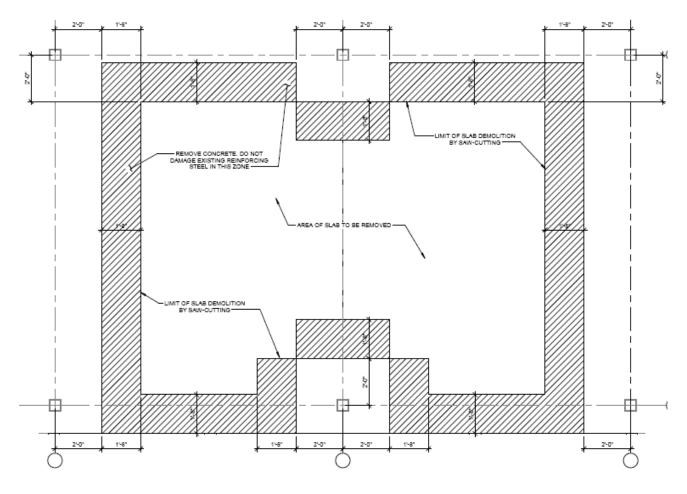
Enlarged Bathroom Slab Repair Plan for Cast-in-Place Concrete | SF503
